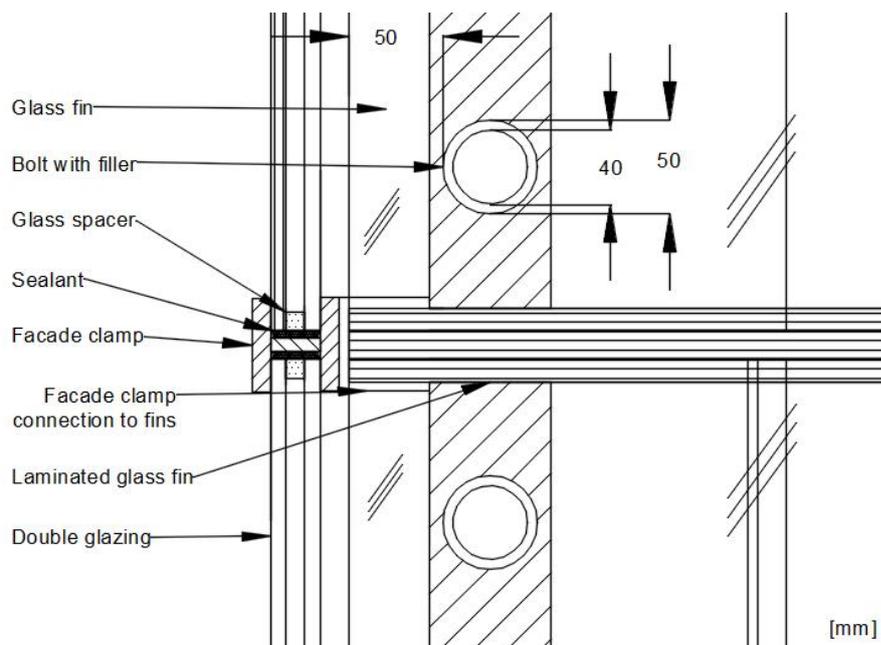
Detail of fin-facade connection. Scale 1:4.
